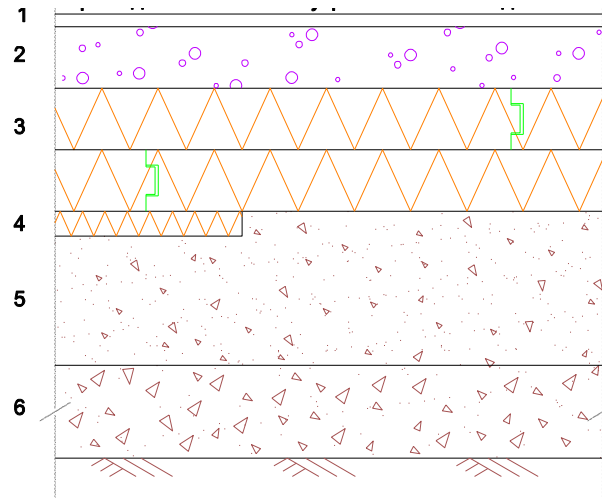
Section ZEB's floor: 1 – flooring; 2 – floor cement screed; 3 – slabs SPU AL 100 + 100 mm; 4 – slabs SPU AL 40; 5 – foundation slab; 6 – pebble dash .
